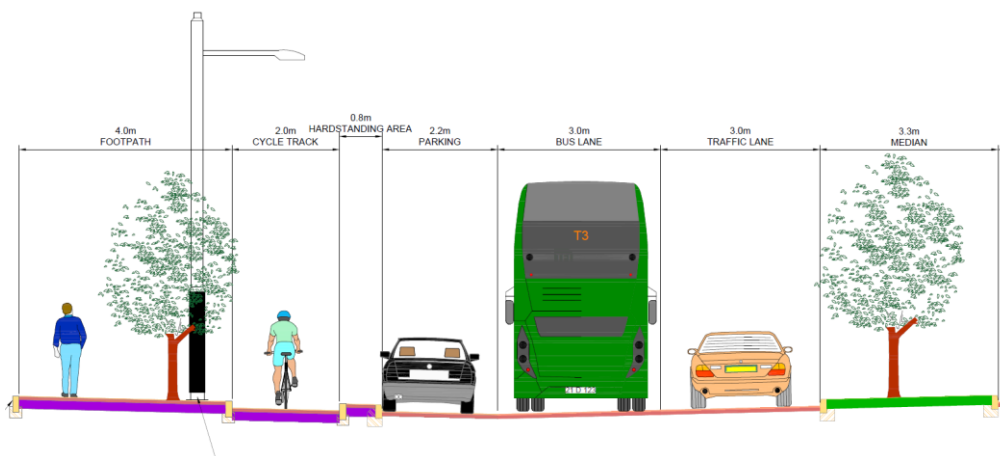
Option B Cross-Section on Ballymun Road (Northbound Carriageway)
